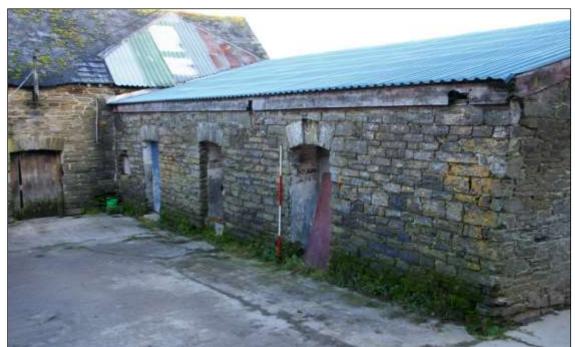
West elevation of Milking Parlour, viewed from the south-west (scale 2m).
